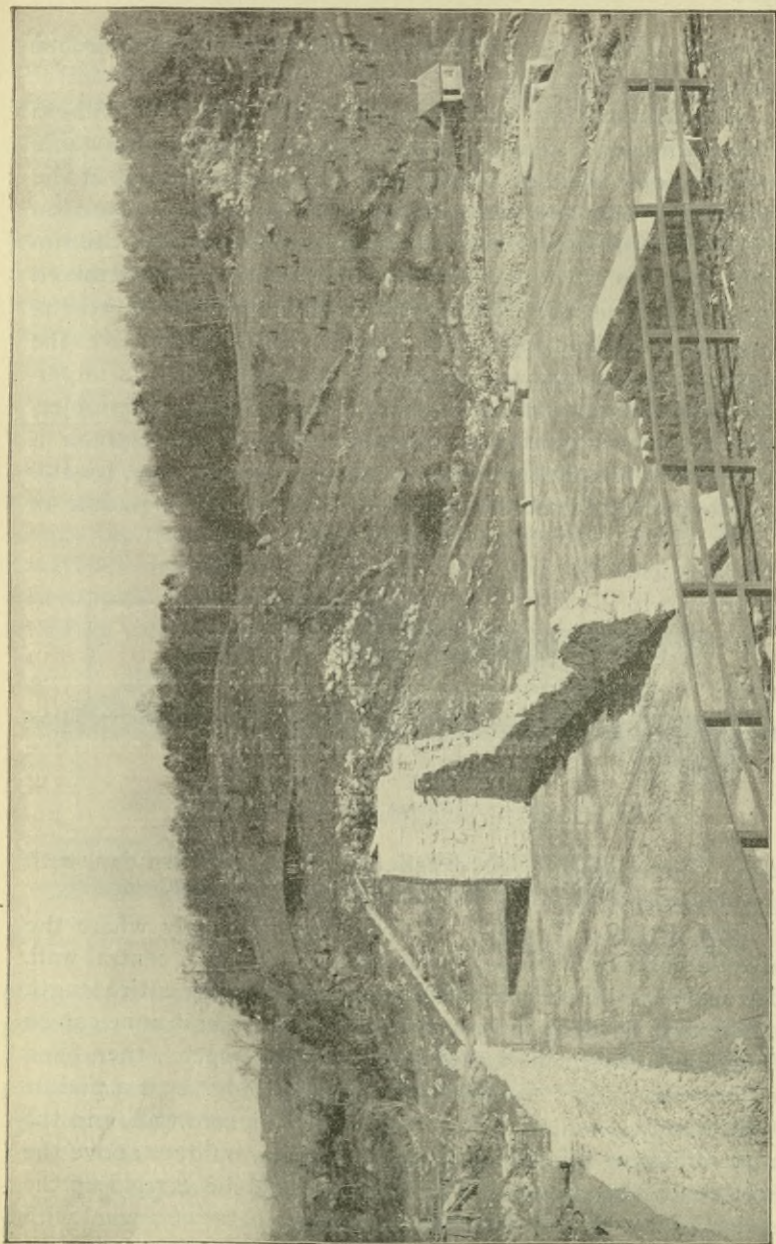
PLATE XXIX.—EARTH DAM AND MASONRY CORE-WALL DURING CONSTRUCTION, CARMEL, N. Y.
